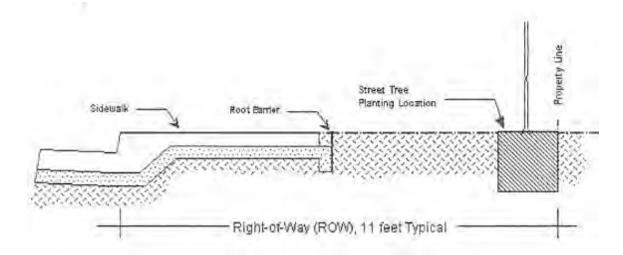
Tree planting diagram for monolithic sidewalk construction.
